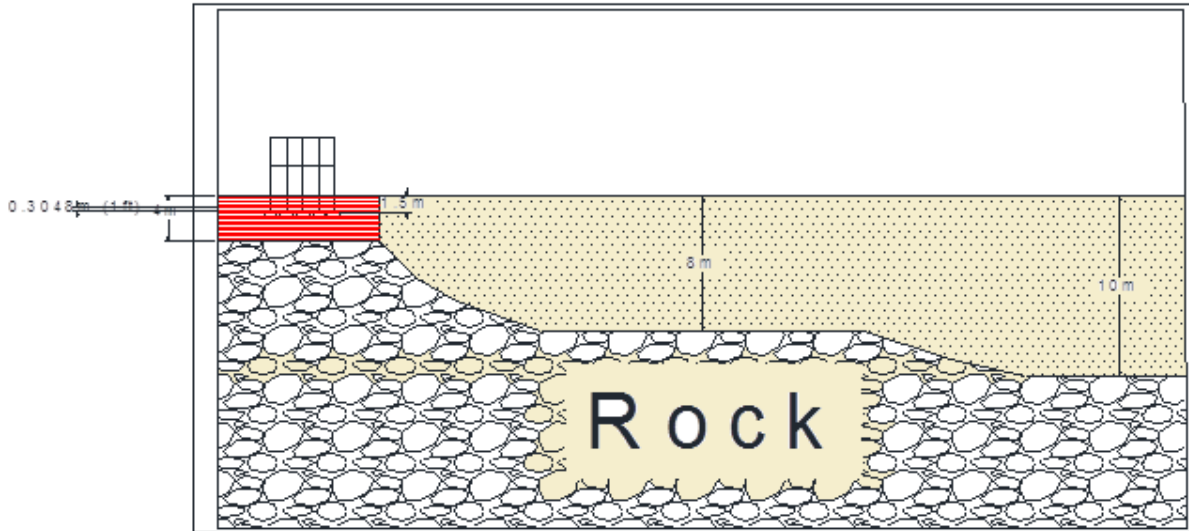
Cross view of the foundation in zone A (replaced ground).
